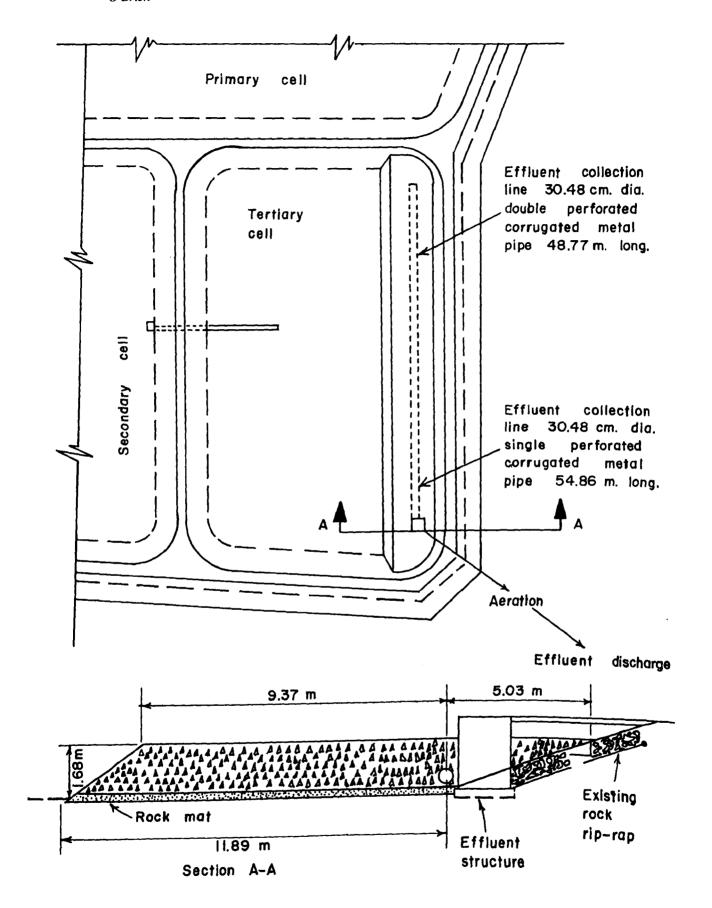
Plan of submerged rock filter constructed at California, Missouri.
